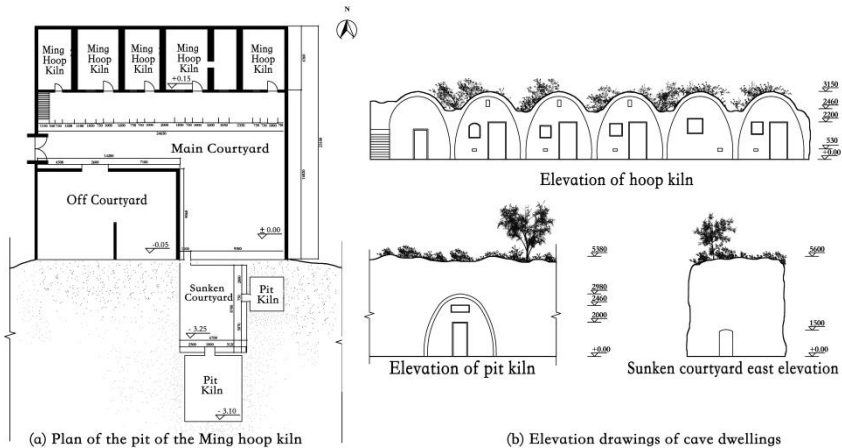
surface elevation of Ming hoop kiln. Source: Author drawing.
